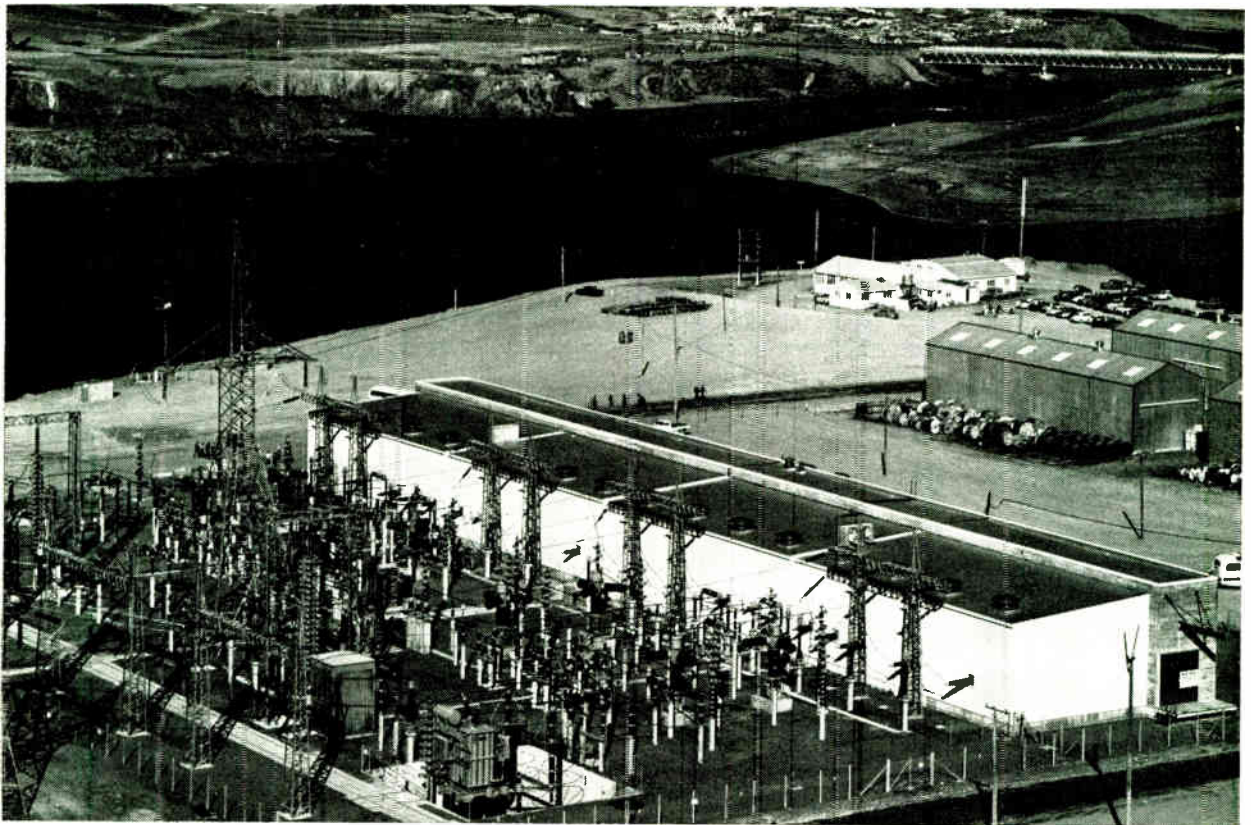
View of outdoor switchyard and building containing valve and rectifier equipment at the high-voltage dc hydro power plant, Benmore, New Zealand.
